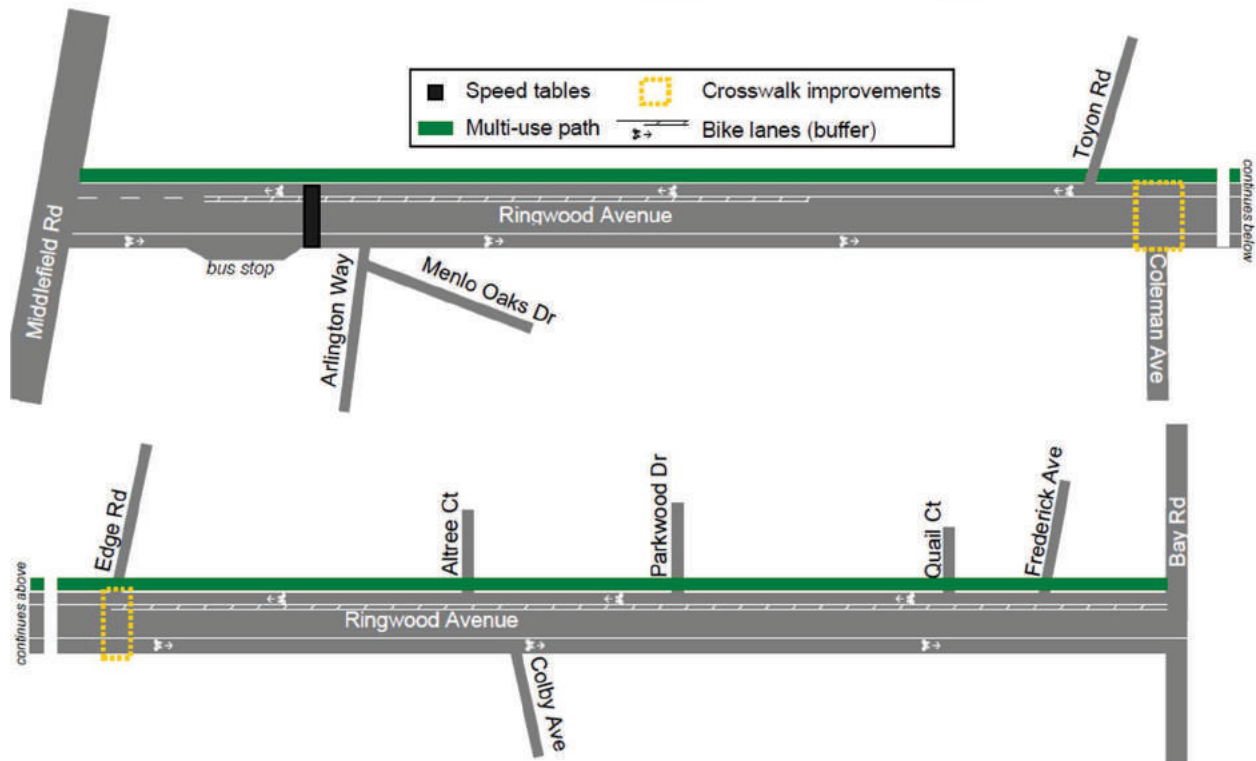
Ringwood Avenue Preferred Alternative Plan View Schematic Bike Lanes (Protected near Schools) with Off-street Pathway
